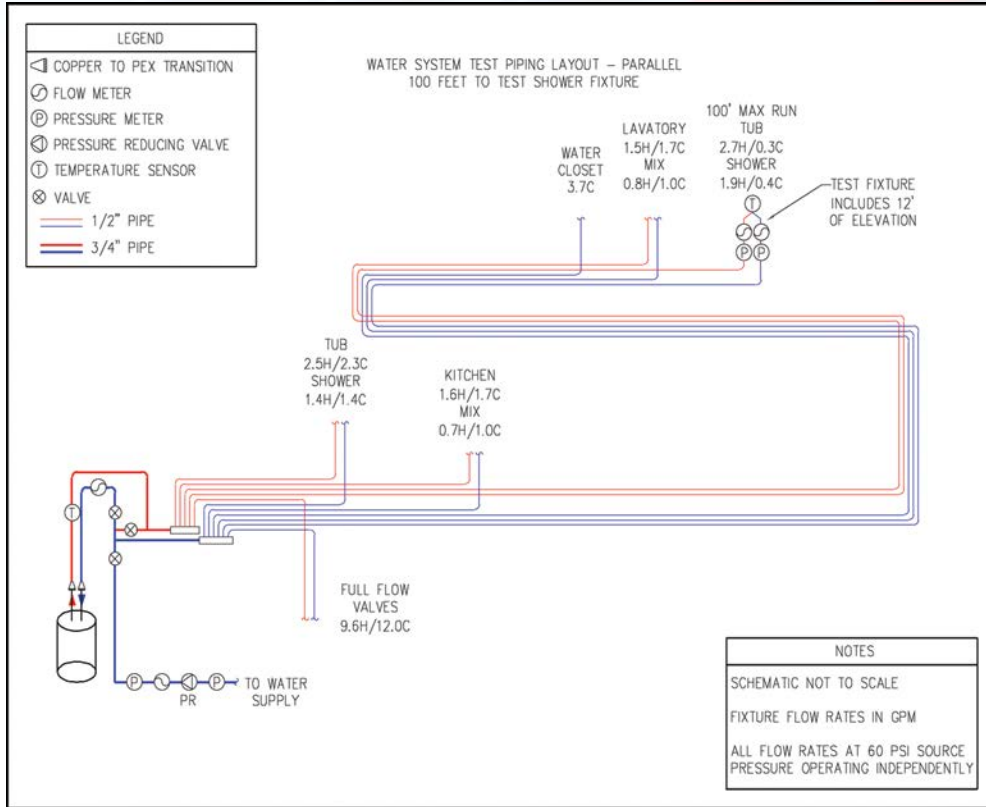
Water System Test Piping Layout – Parallel, 100' to TF
